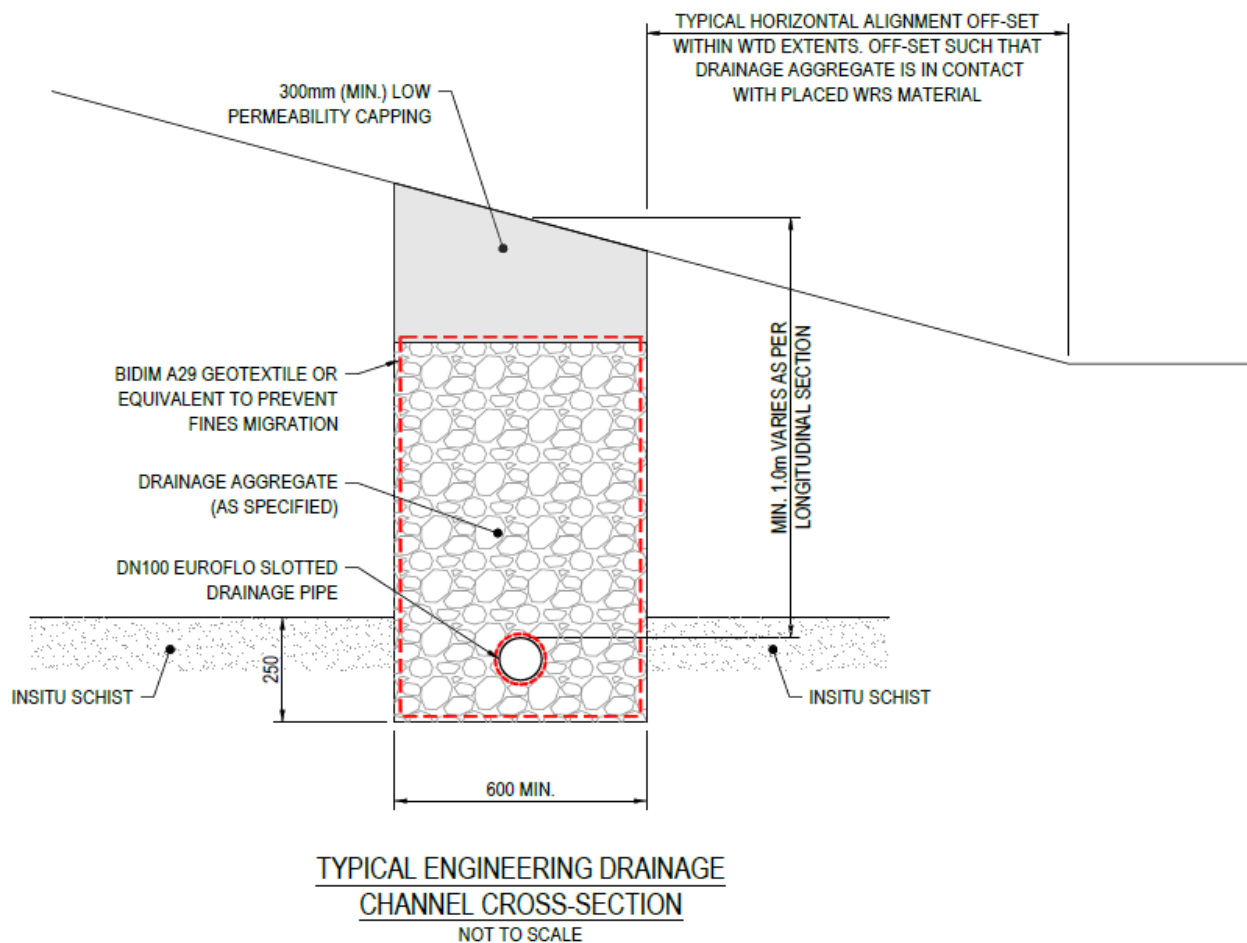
Typical cross section detail of a seepage capture drain (GHD, 2026a)
